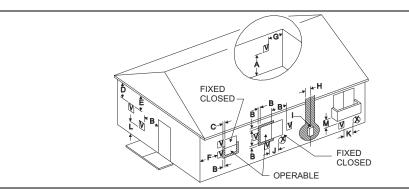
Typical Sidewall Vent and Termination Configuration
